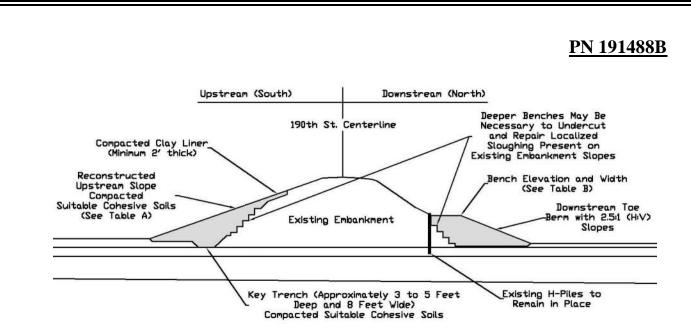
Embankment Cross Section with Slope Improvement Concepts
